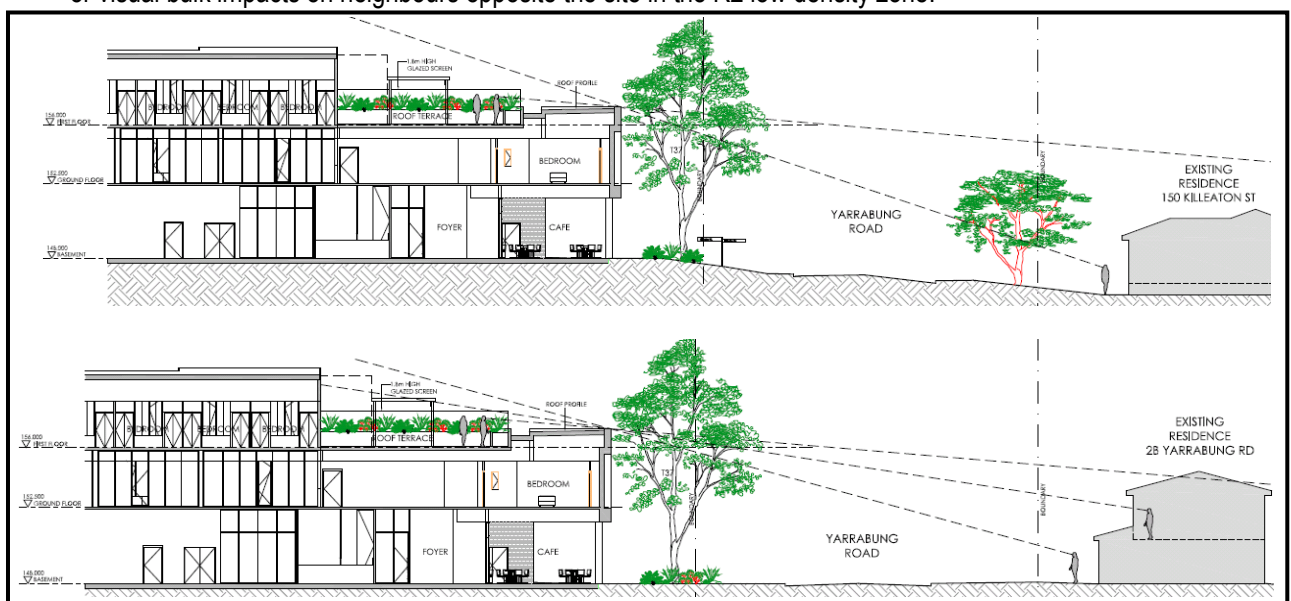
Sections illustrating sight lines from Yarrabung Road properties to the RACF
